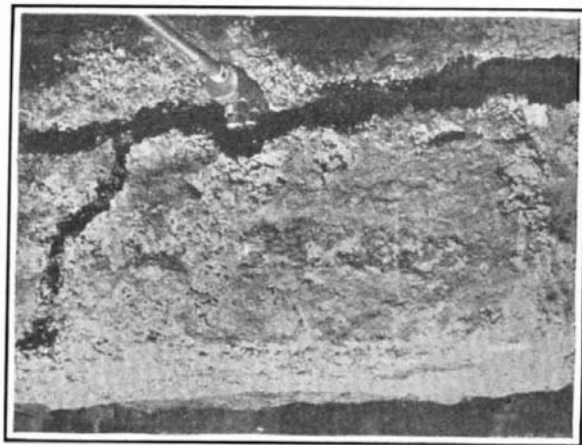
Hydraulic cartridge used in a bed of concrete.
